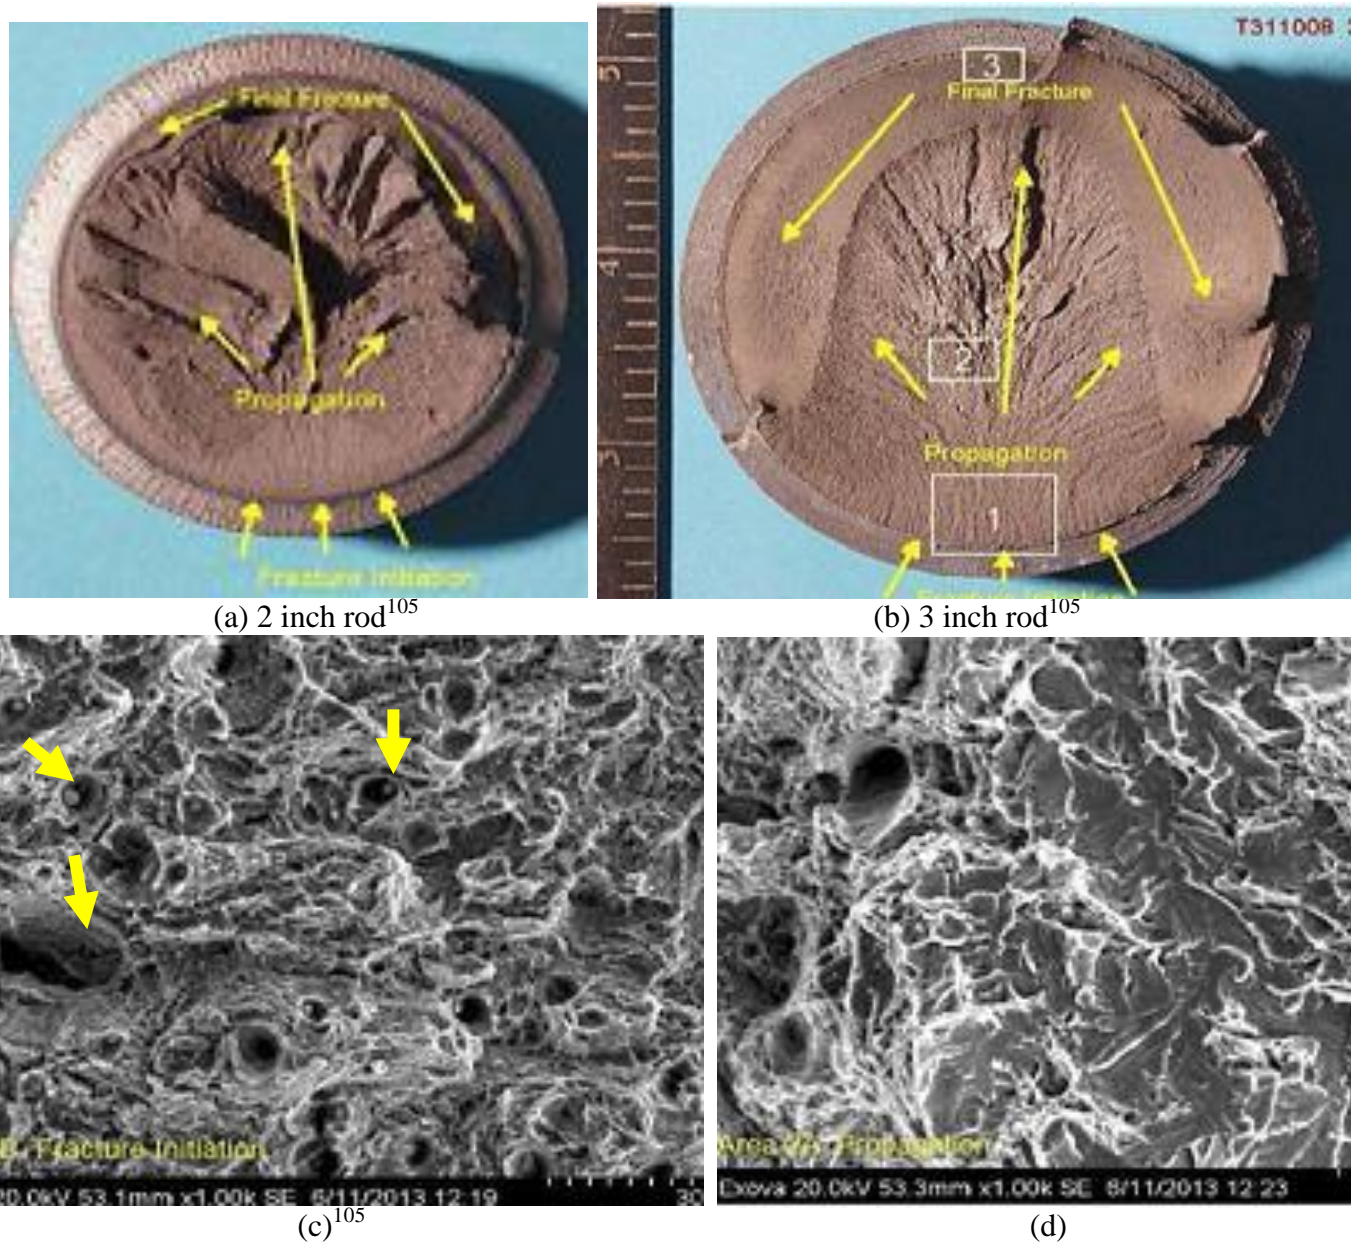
(a) & (b) More examples of 2 inch and 3 inch anchor rod full size tensile test fracture fracture faces. The top two yellow arrows are wrong. (c) & (d) Scanning electron fractographs of areas 1 and 2, respectively, in (b). (c) consists entirely of dimpled fractures. Large holes usually form around inclusions. (d) consists of 50:50 dimples and cleavages. Dimples are associated with ductile fractures in steel; cleavages with brittle fractures. The fractograph of (d) is a good example of what looks like a brittle fracture macroscopically is not all brittle microscopically.
